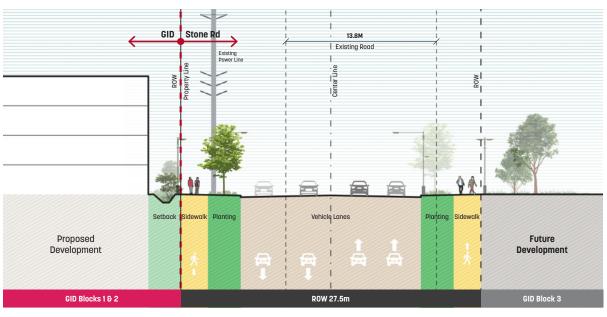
Stone Rd E typical cross section, facing east (Sasaki, April 10, 2024)
